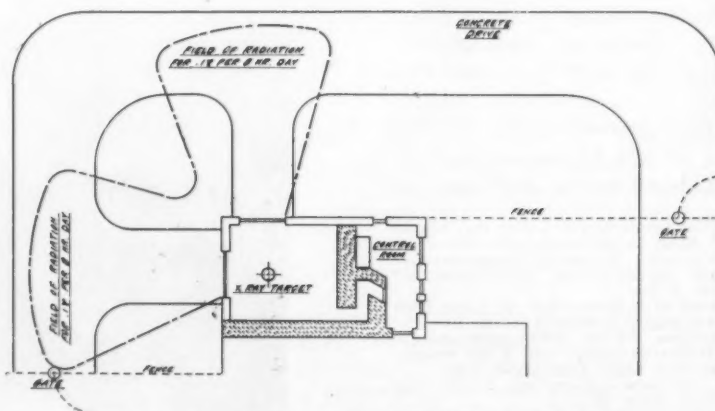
Ground Floor Plan of High-Voltage Building.
